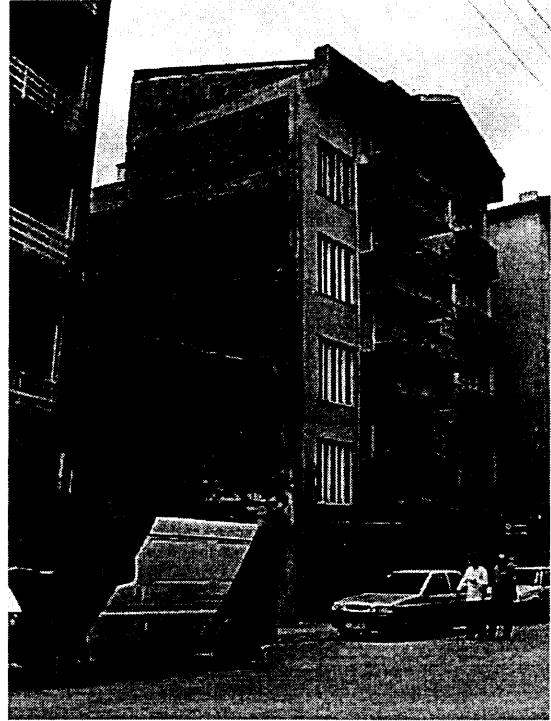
5-story high reinforced concrete building (E2 in Figure 2)
